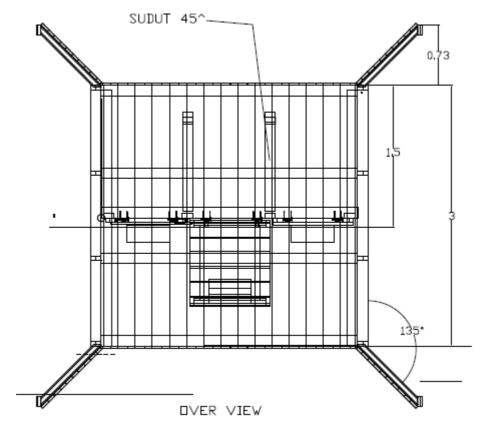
Standard Design of Flap Gate (Conceptual Drawing)
